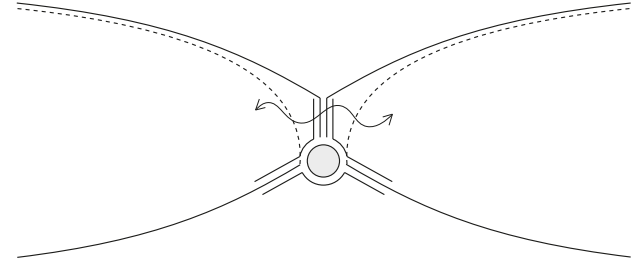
Detail / ETFE connection to ground, scale 1:10
